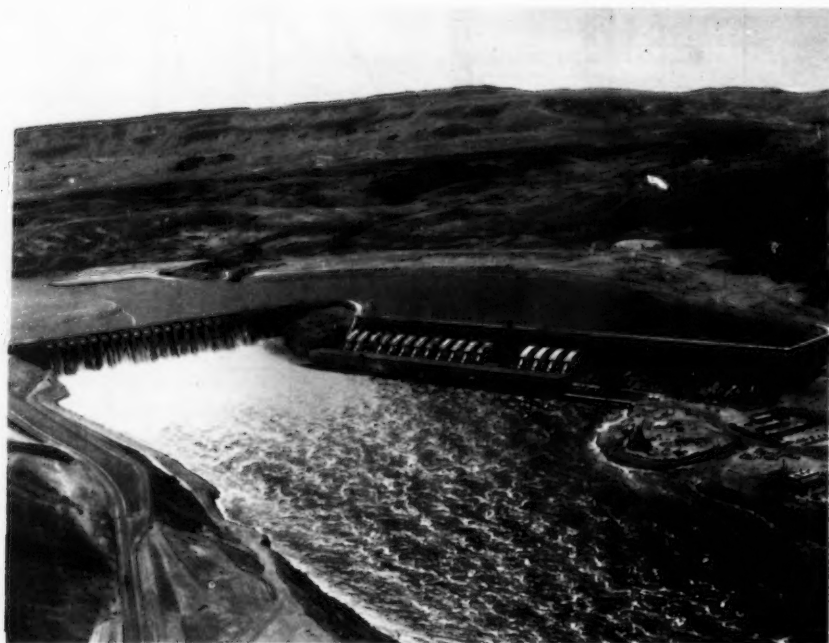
CHIEF JOSEPH DAM. FLOW OVER COMPLETED SPILLWAY.
